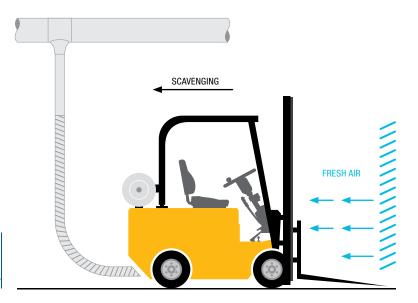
LOCAL VENTILATION OF A MAINTENANCE WORKSTATION
